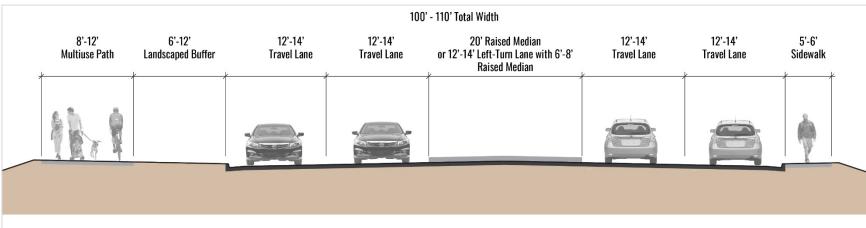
Typical Section for E. 88th Avenue between Brighton Road and Rosemary Street
